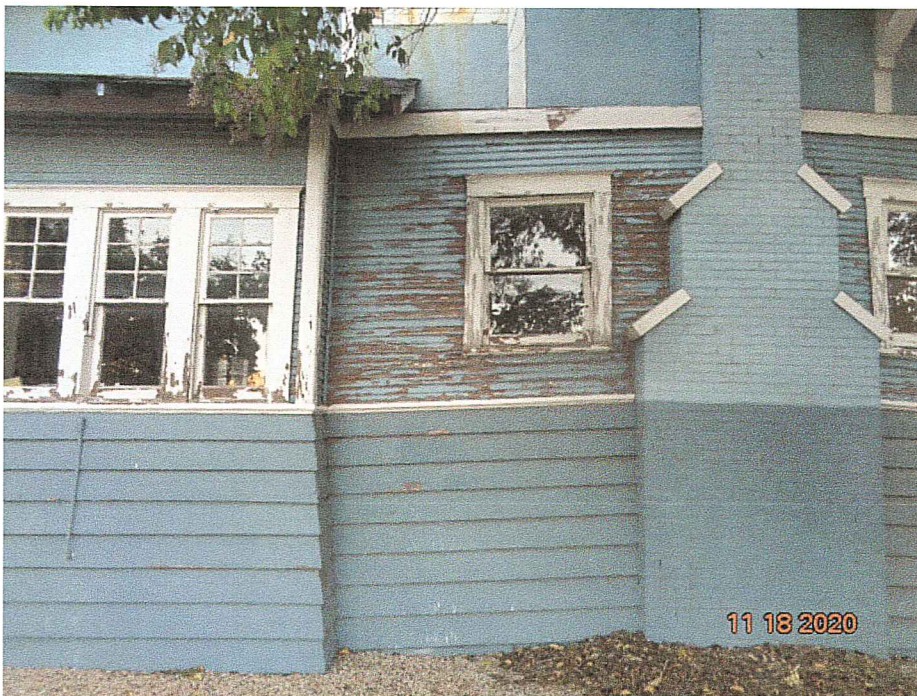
view looking southward at north side wall at eastern portion of north wall. Note uneven siding framing construction at left side of photograph
